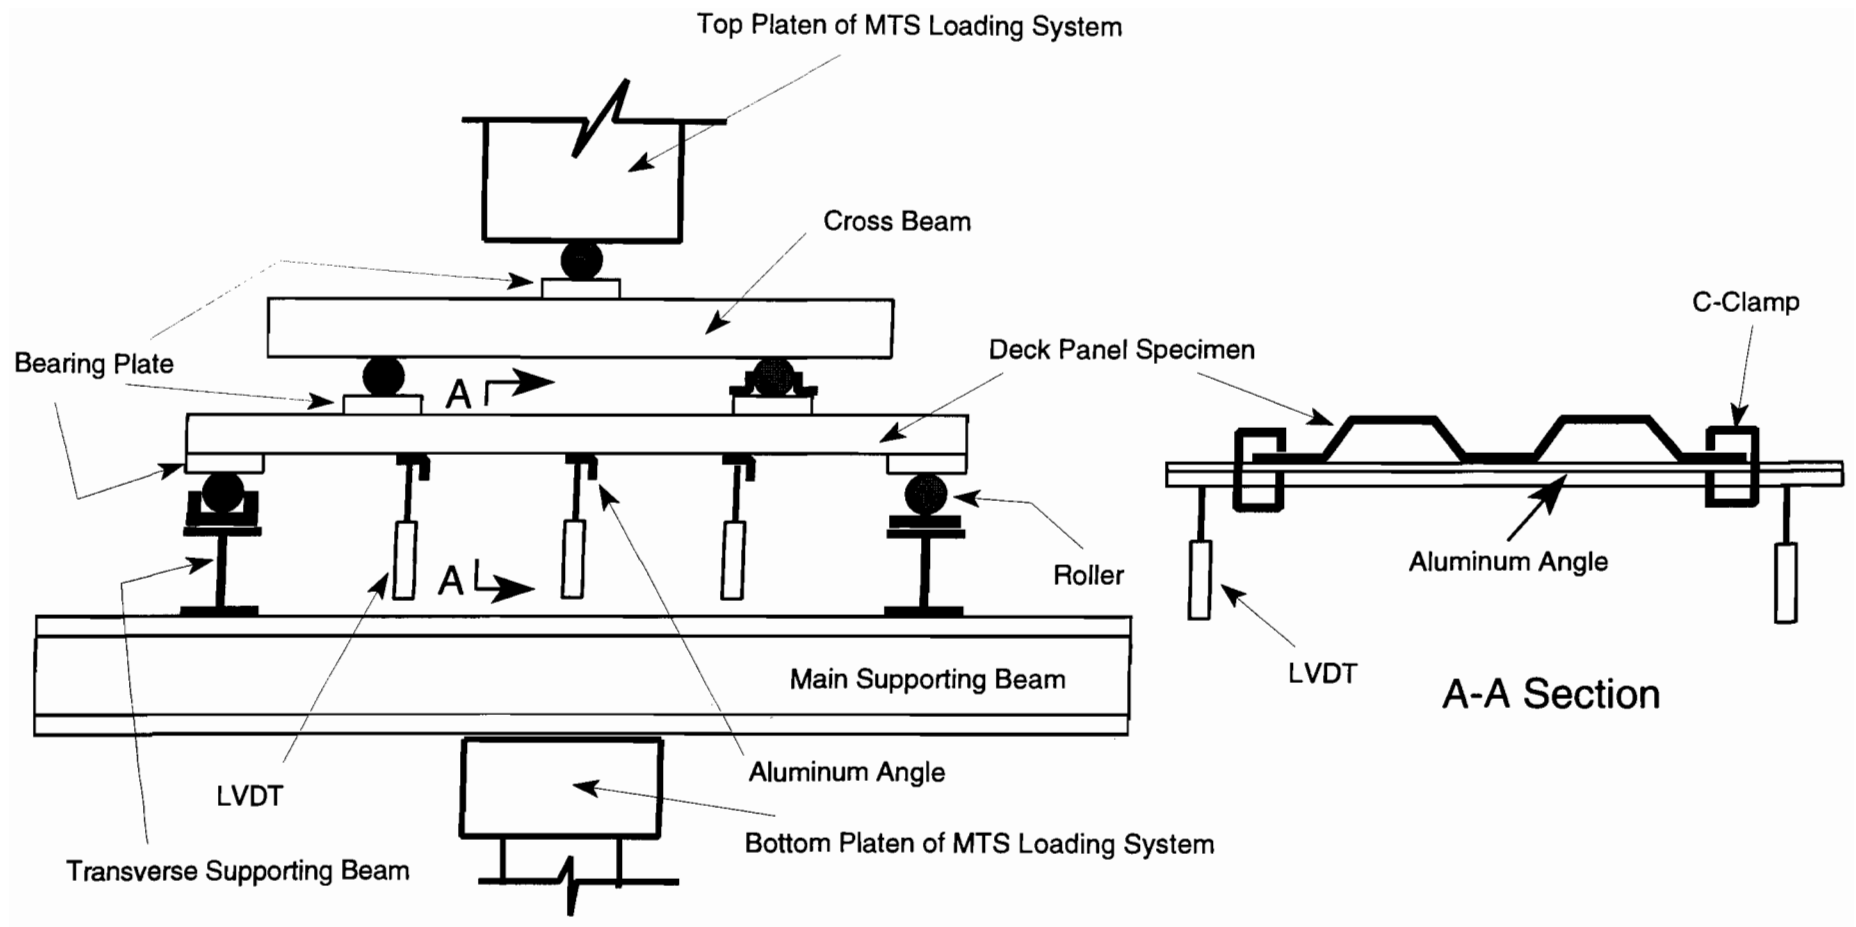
Test Setup for Deck Panels with Two-Point Loading Condition
